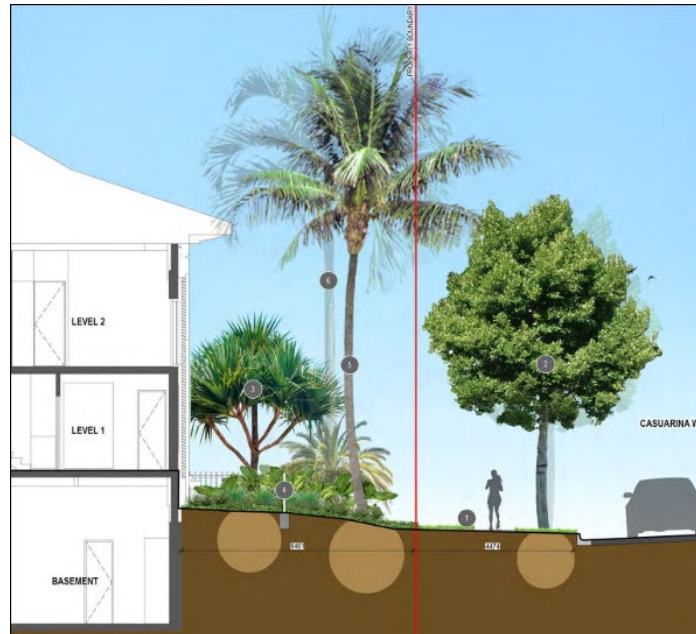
Excerpt from Landscape Plan – Sections -Sheet 3 DA-L-9052 (Revision 8) prepared by Laud Ink and dated 15 December 2023.
